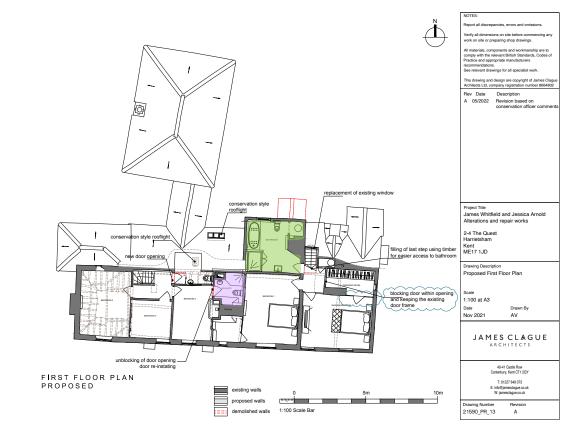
Proposed First Floor Plan as approved in the Full Planning Application 22/051143/FULL and Listed Building Consent 22/501261/LBC.
